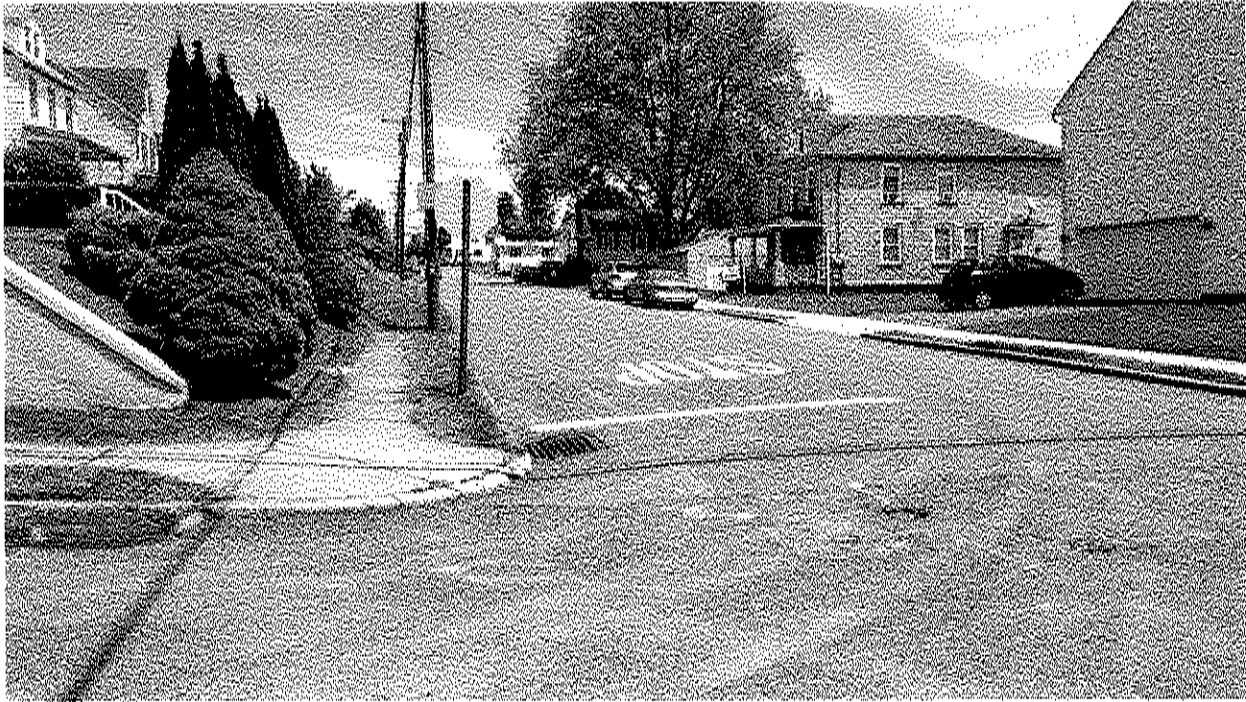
View from Wilbur Street at intersection Pursel Street looking left towards Green Street
